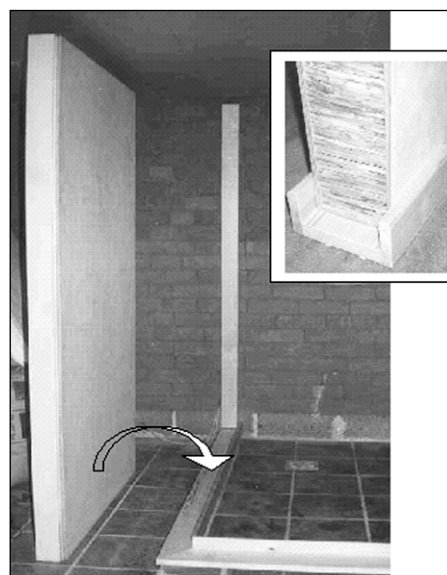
Installing of LNS building elements into joint trims; cross section of wall and floor joint trim (upper right)
